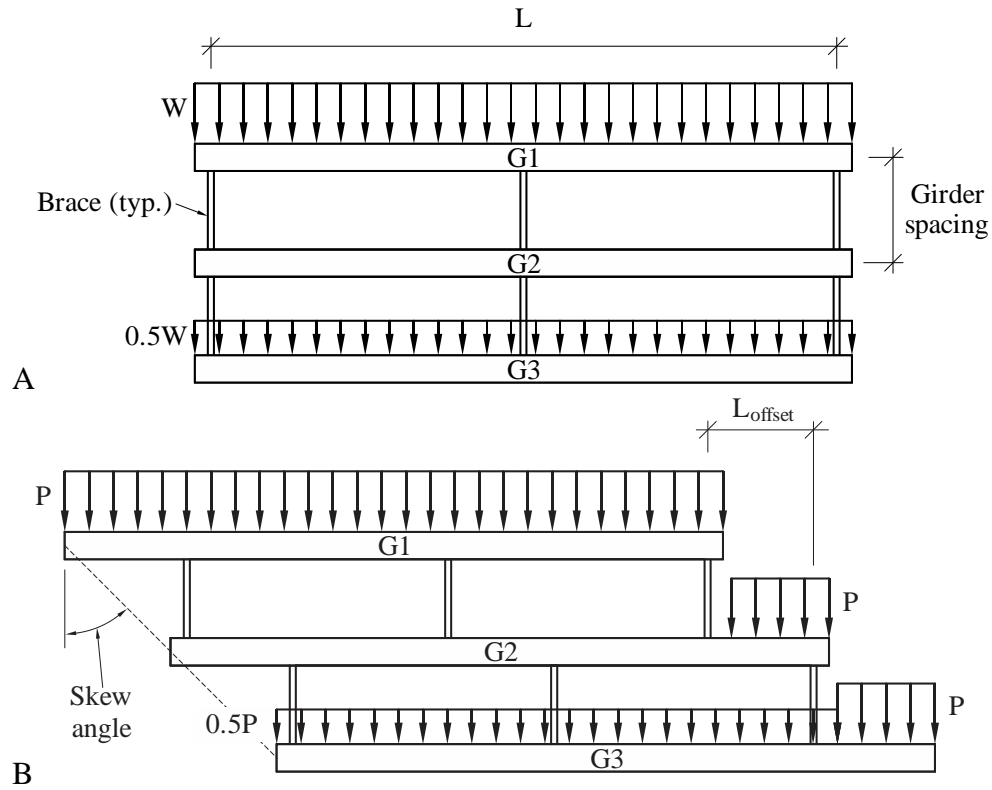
Effect of bridge skew on wind loading of braced 3-girder system (plan view). A) Unskewed system. B) Skewed system.
